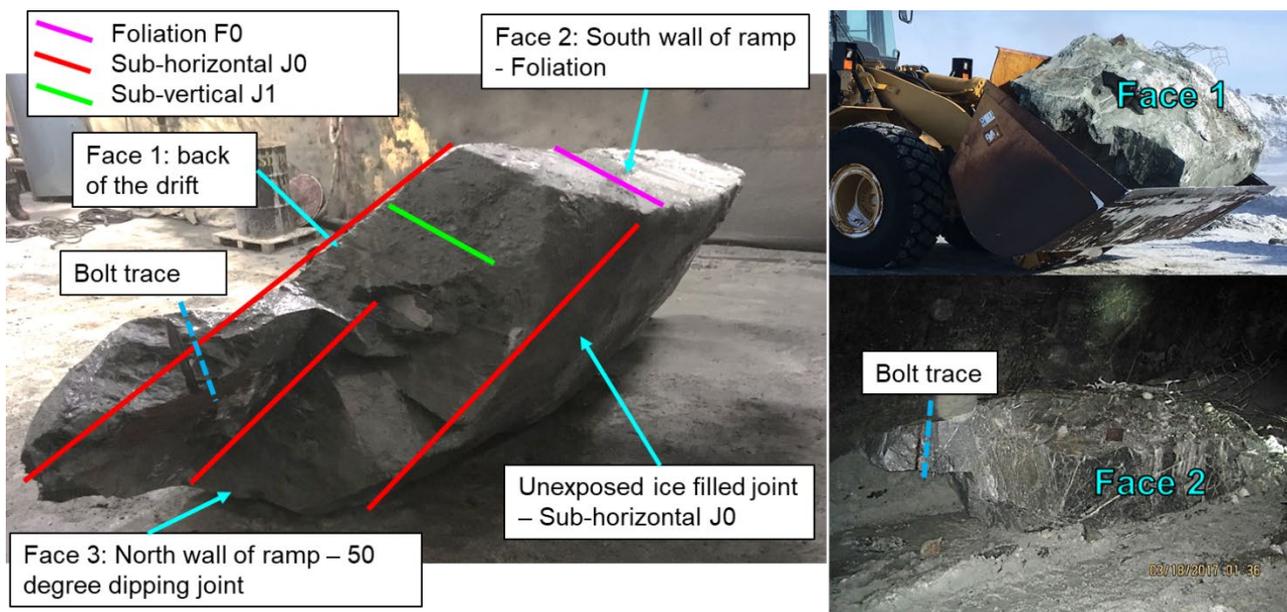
A block weighing approximately 8 tonnes fell from the roof of the excavation
